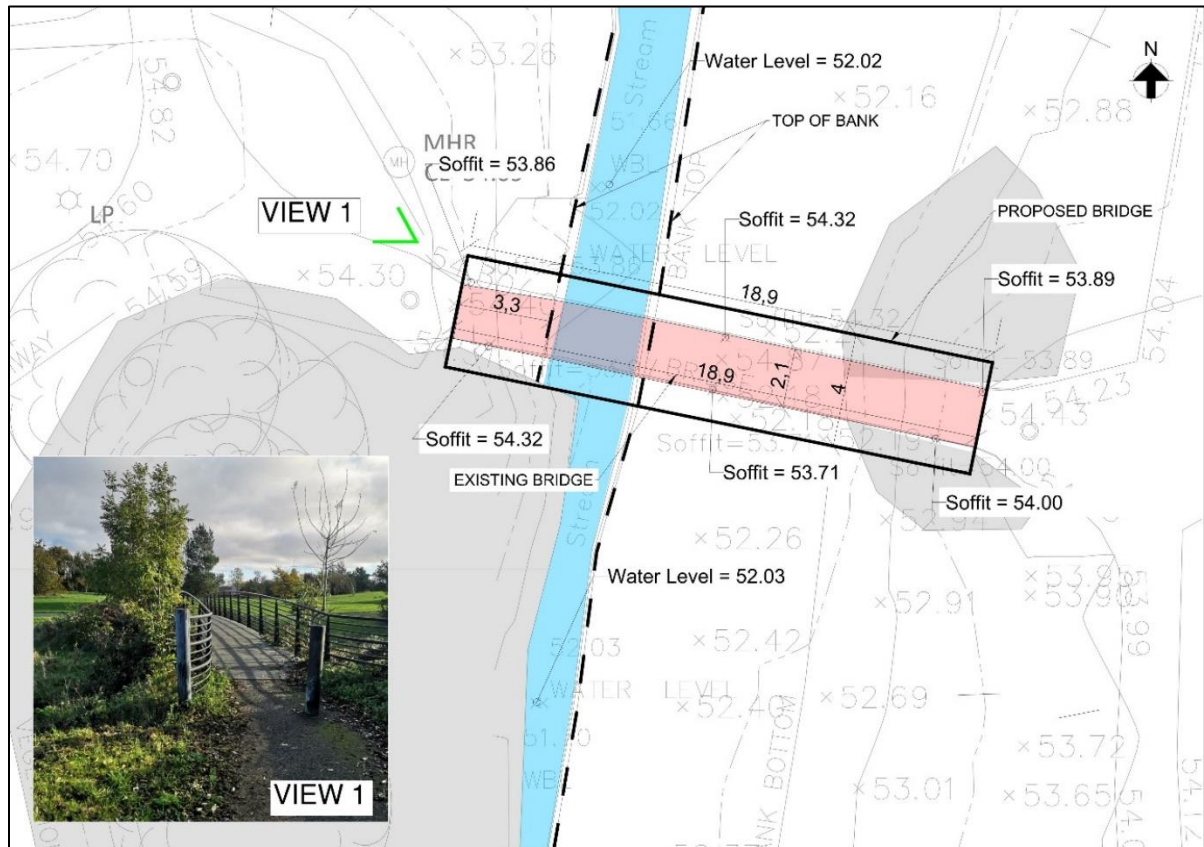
Plan View of Existing and Proposed River Griffeen Crossing No.1 (Source: Arup)
